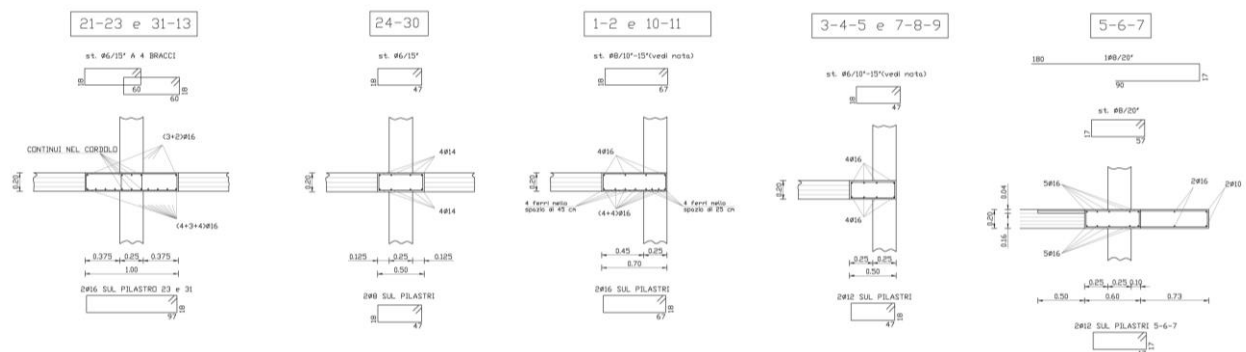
Technical drawings of the details of some RC beams at the first floor – Source: [151]
